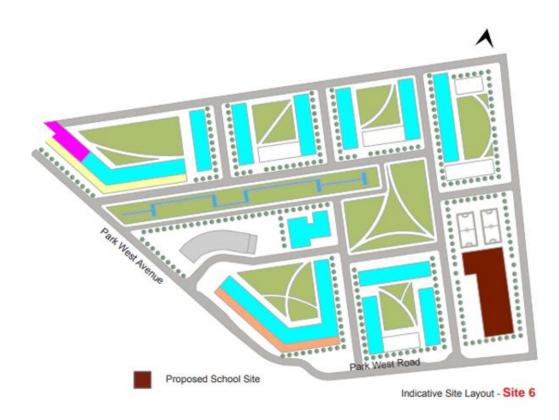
Proposed School Site within Key Development Site 6 under the Local Area Plan 2019
